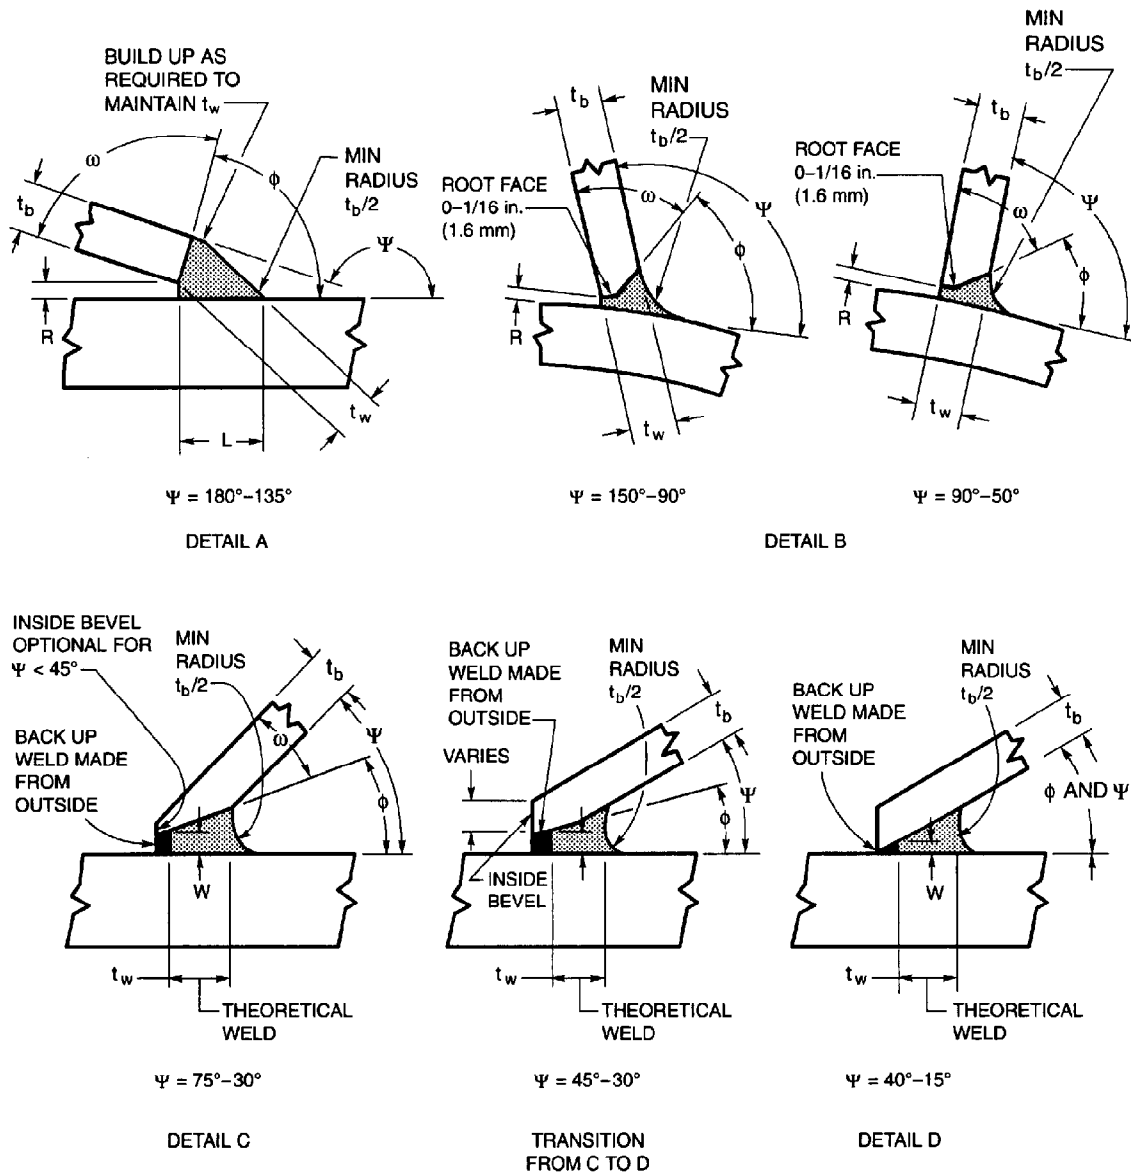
Prequalified Joint Details for Complete Joint Penetration Groove Welds in Tubular T-, Y-, and K-Connections—Standard Flat Profiles for Limited Thickness (see 3.13.4)
